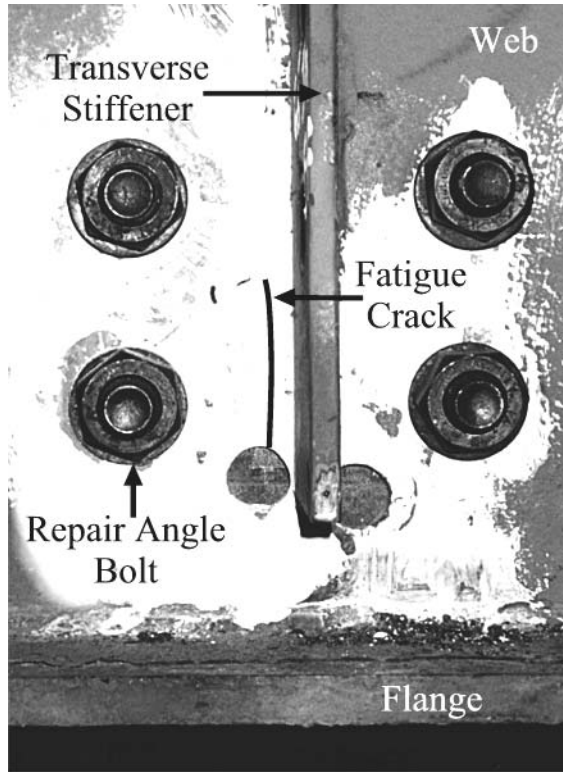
Fatigue Crack on West Face of Joint 12, Specimen 5
